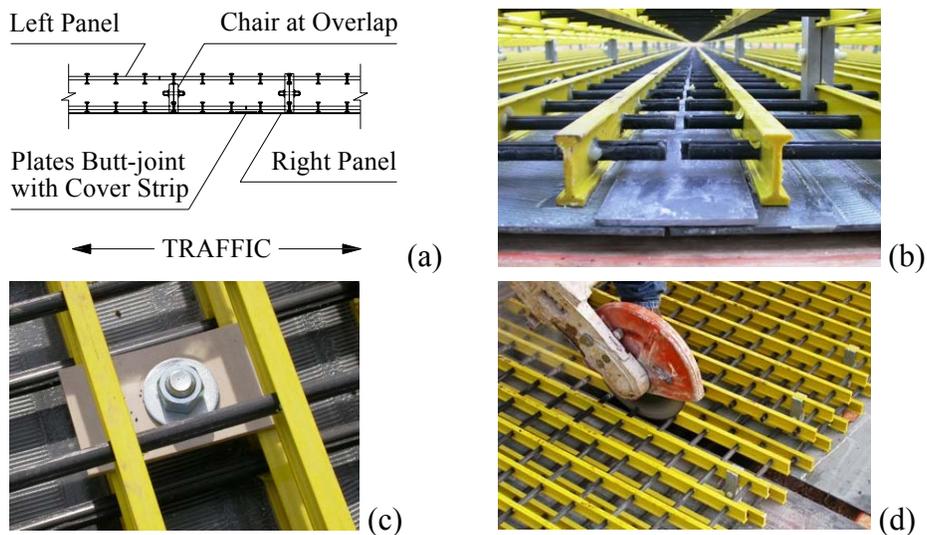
GridForm detailing: panel-to-panel overlap connection (a, b); anchoring to girder (c); and cutting of end panels at expansion joint (d).
